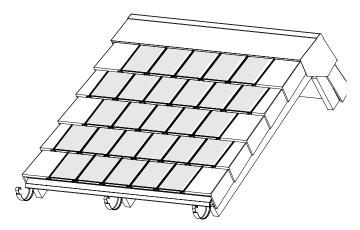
Simplified example roof with Meyer Burger Tile (gray) from eaves to ridge and complementary tiles (white)
